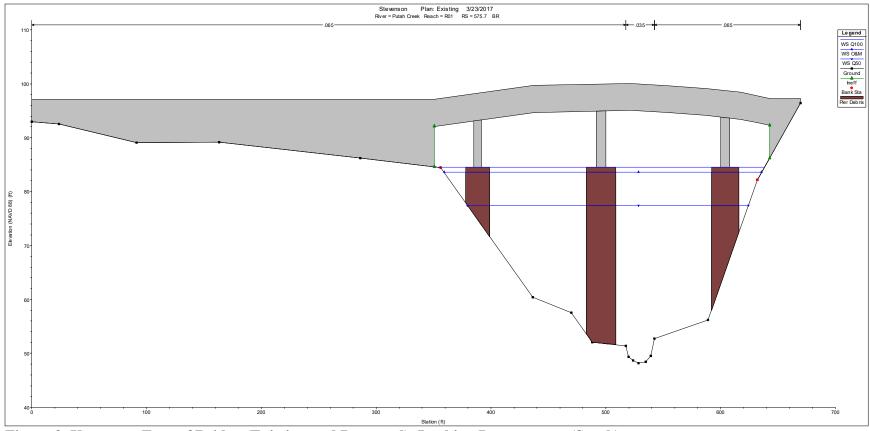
Upstream Face of Bridge (Existing and Proposed), Looking Downstream (South)
